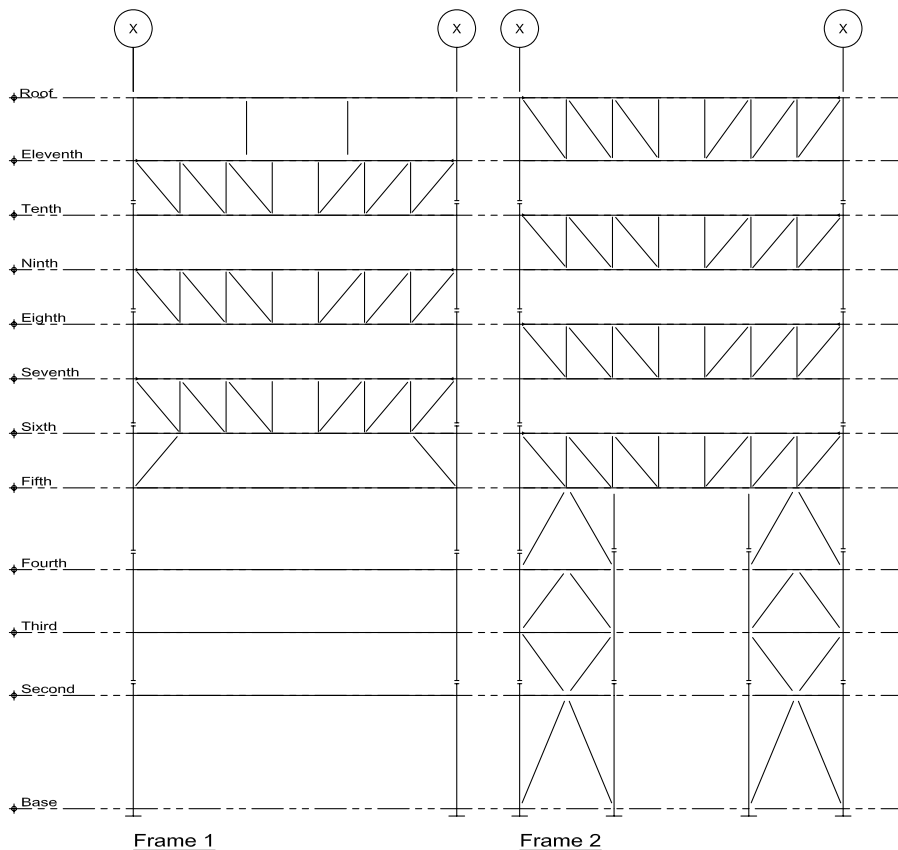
Typical staggered truss frame elevations. Lateral bracing in the direction parallel to the trusses continues down through the lower levels of the structure.
